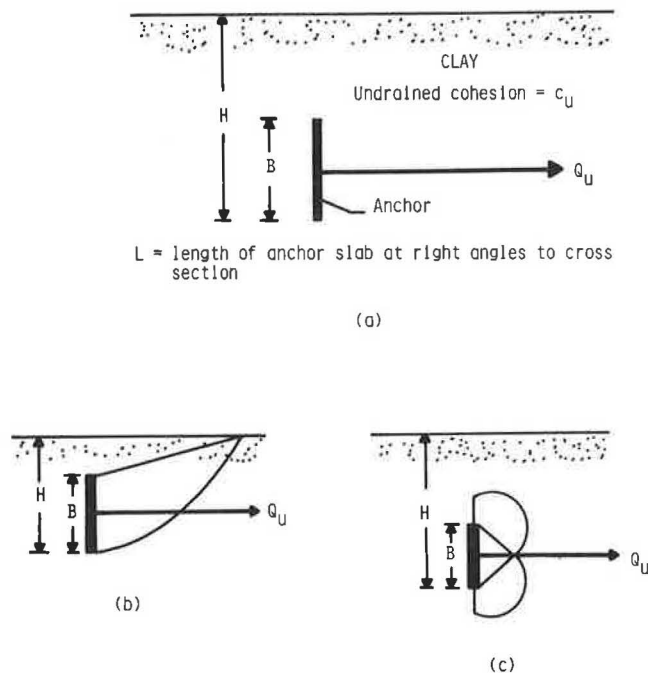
Parameters of a vertical anchor slab (a); definition of a shallow anchor (b); and definition of a deep anchor (c).
